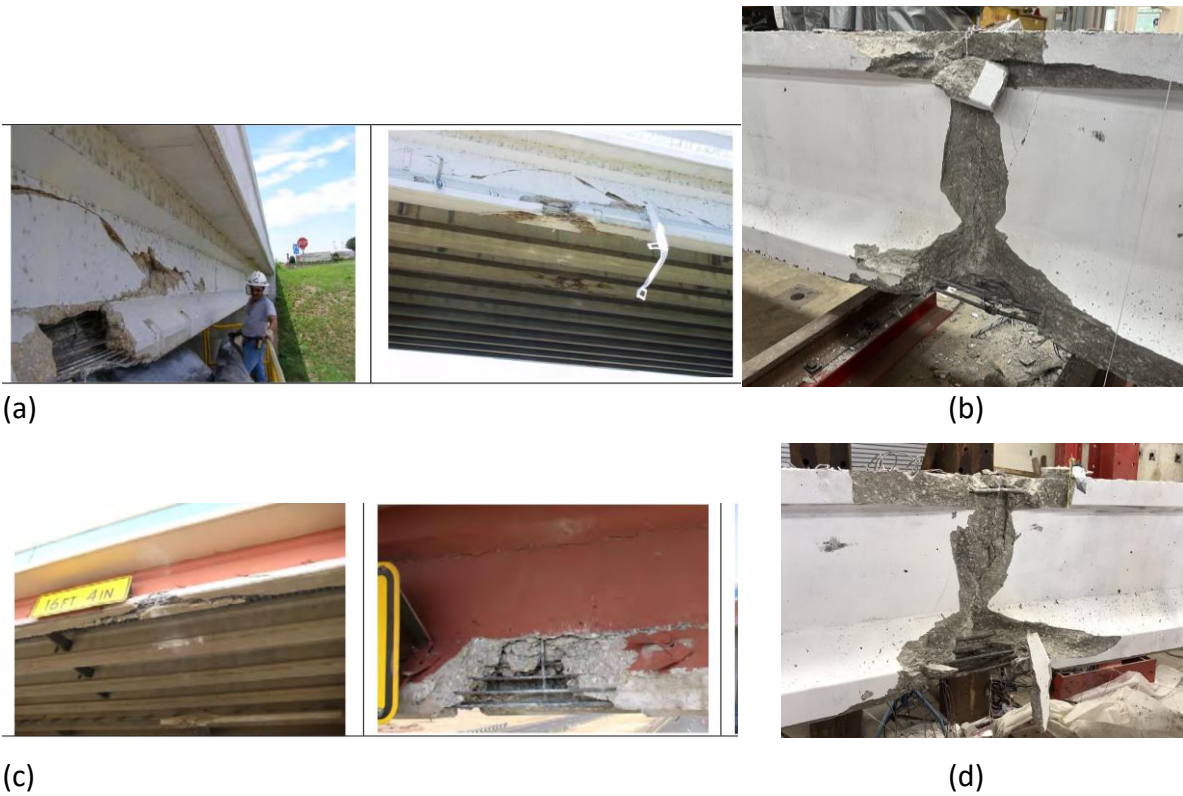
(a) Bridge over US 67, (b) Girder G01, (c) FM 1788 over IH20 AASHTO I-girder, Texas (d) Girder G06
